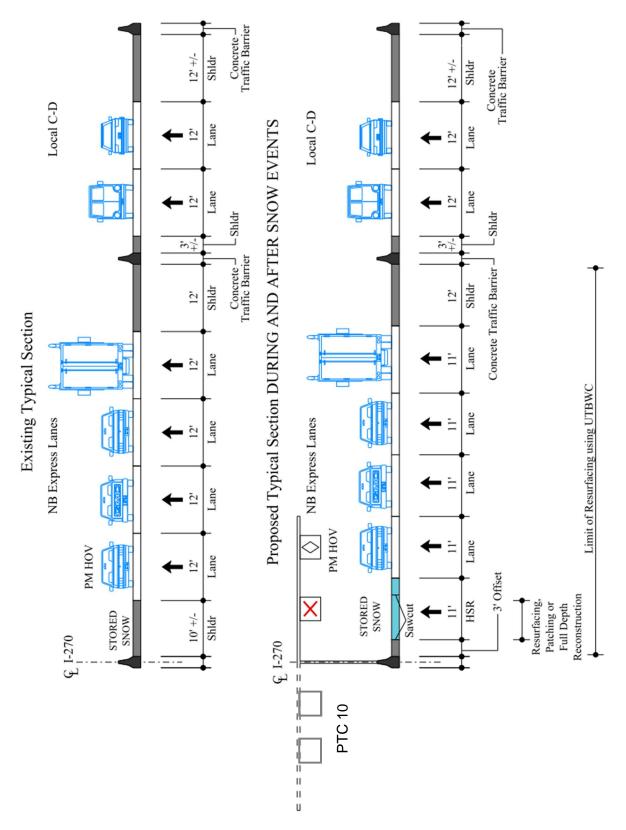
Existing and Proposed Typical Sections NB IS-270 During and After Snow Events
